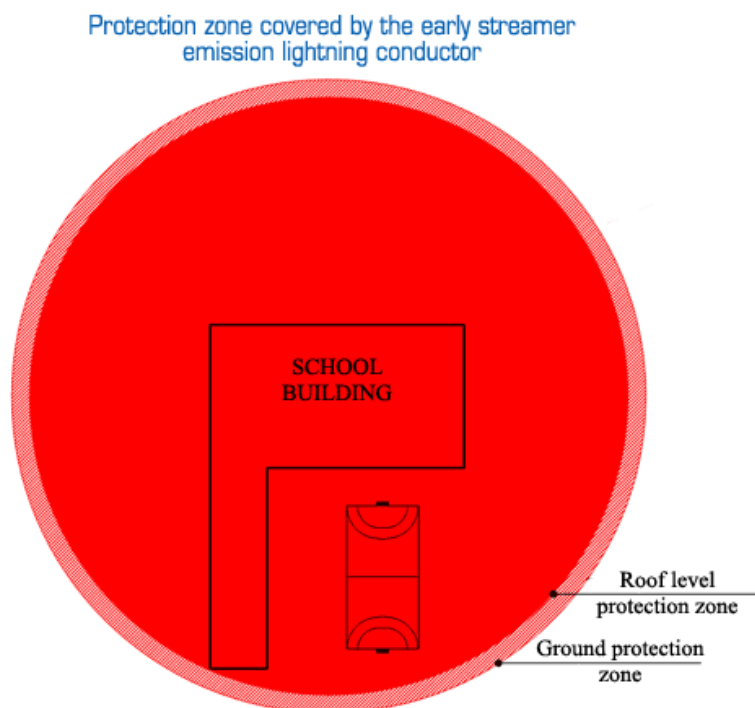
The claimed protection zone provided by the single ESE lightning rod for the school building and surrounding area (including the playing field). (Source: GIMELEC)
